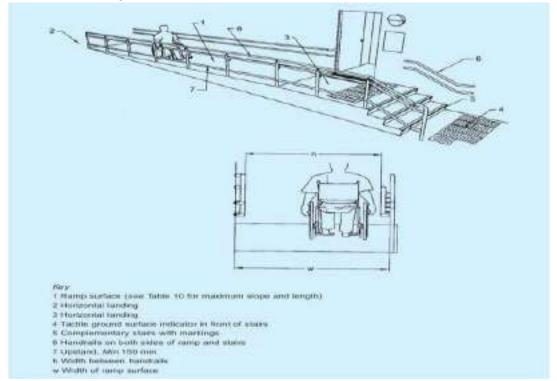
Examples of ramp with slope 1:20 and horizontal landings at beginning and end
